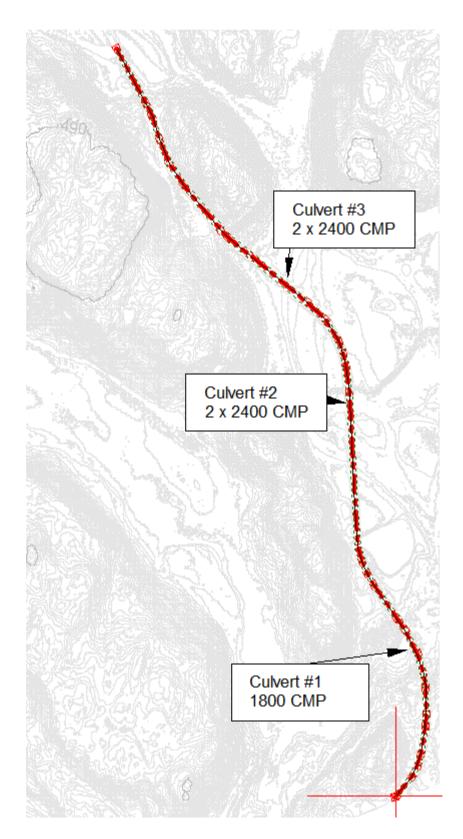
Eacom road design for mainline 1 with culvert locations and sizes.
